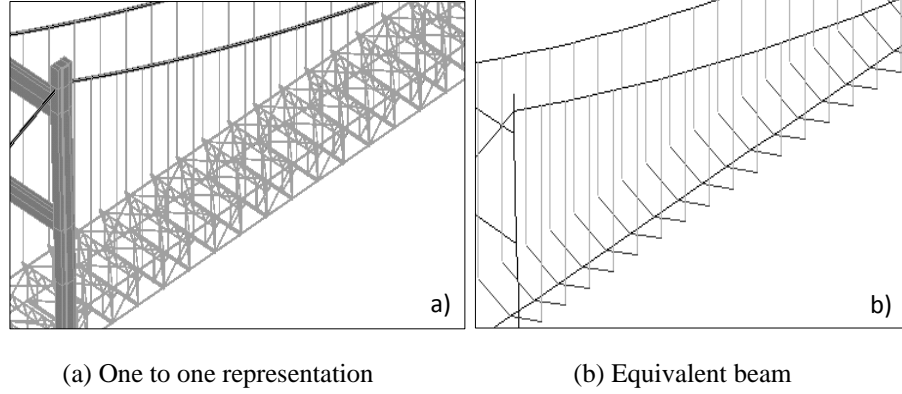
Main girder FE details: complete (a) and simplified (b) version
